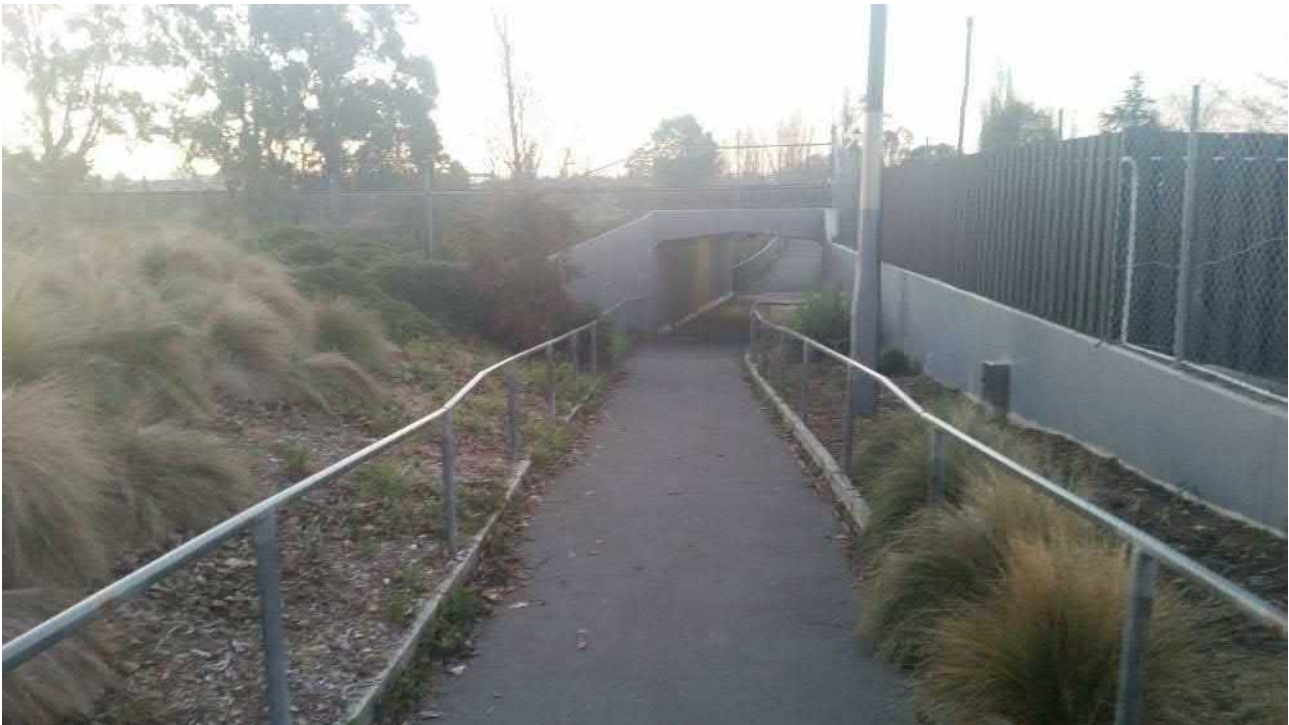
Denton Park/Kyle Park Railway Underpass
